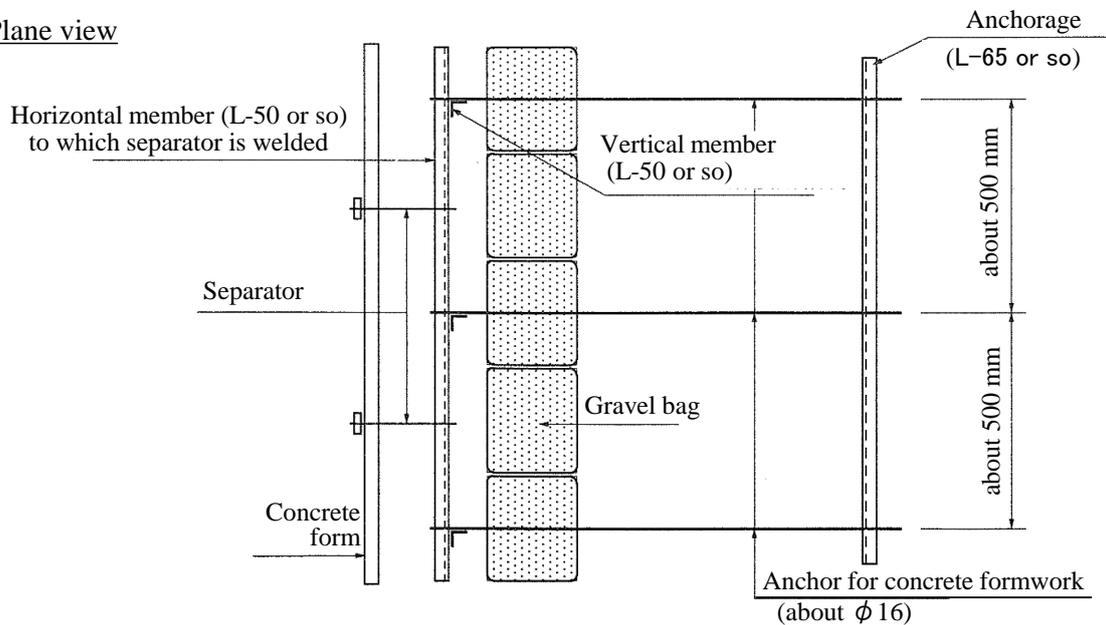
Details of installing concrete form for the facing construction
